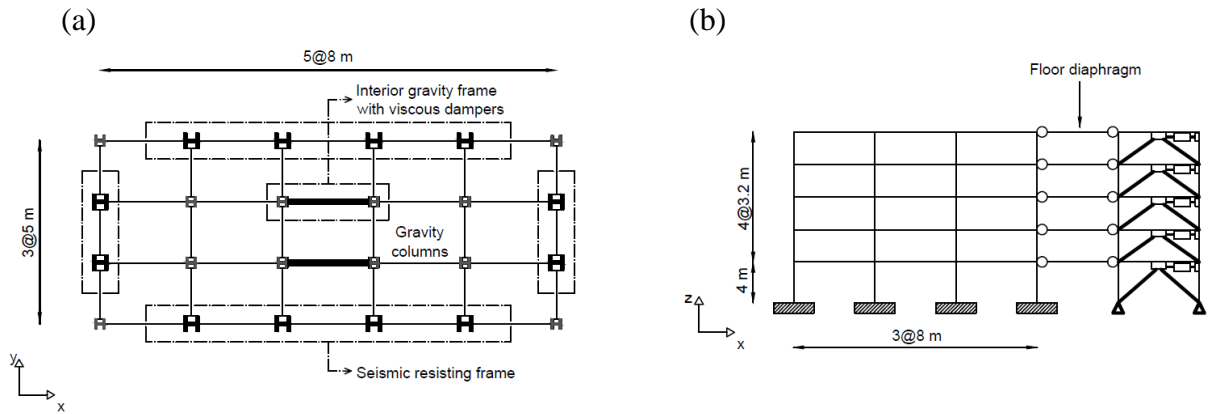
(a) Plan view of the prototype building; (b) Elevation view of the prototype building.
